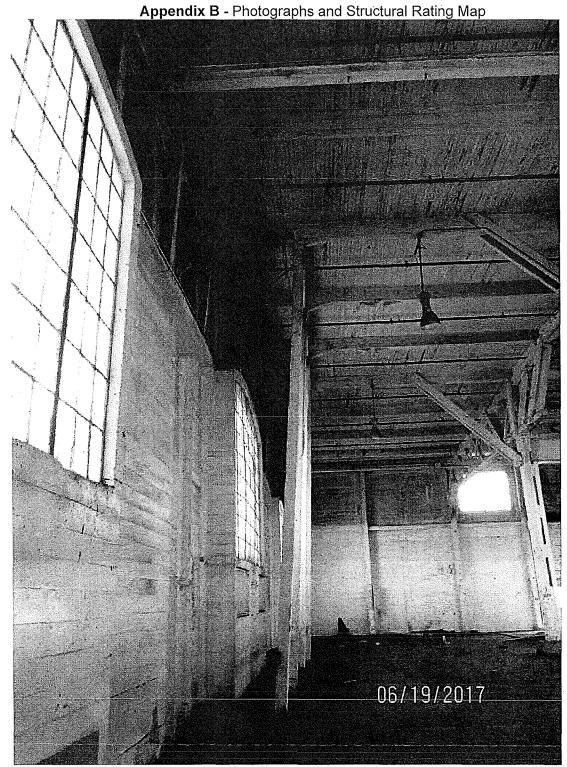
Shoring posts under roof beams near rear wall. Posts are keyed into substructure concrete slab.
